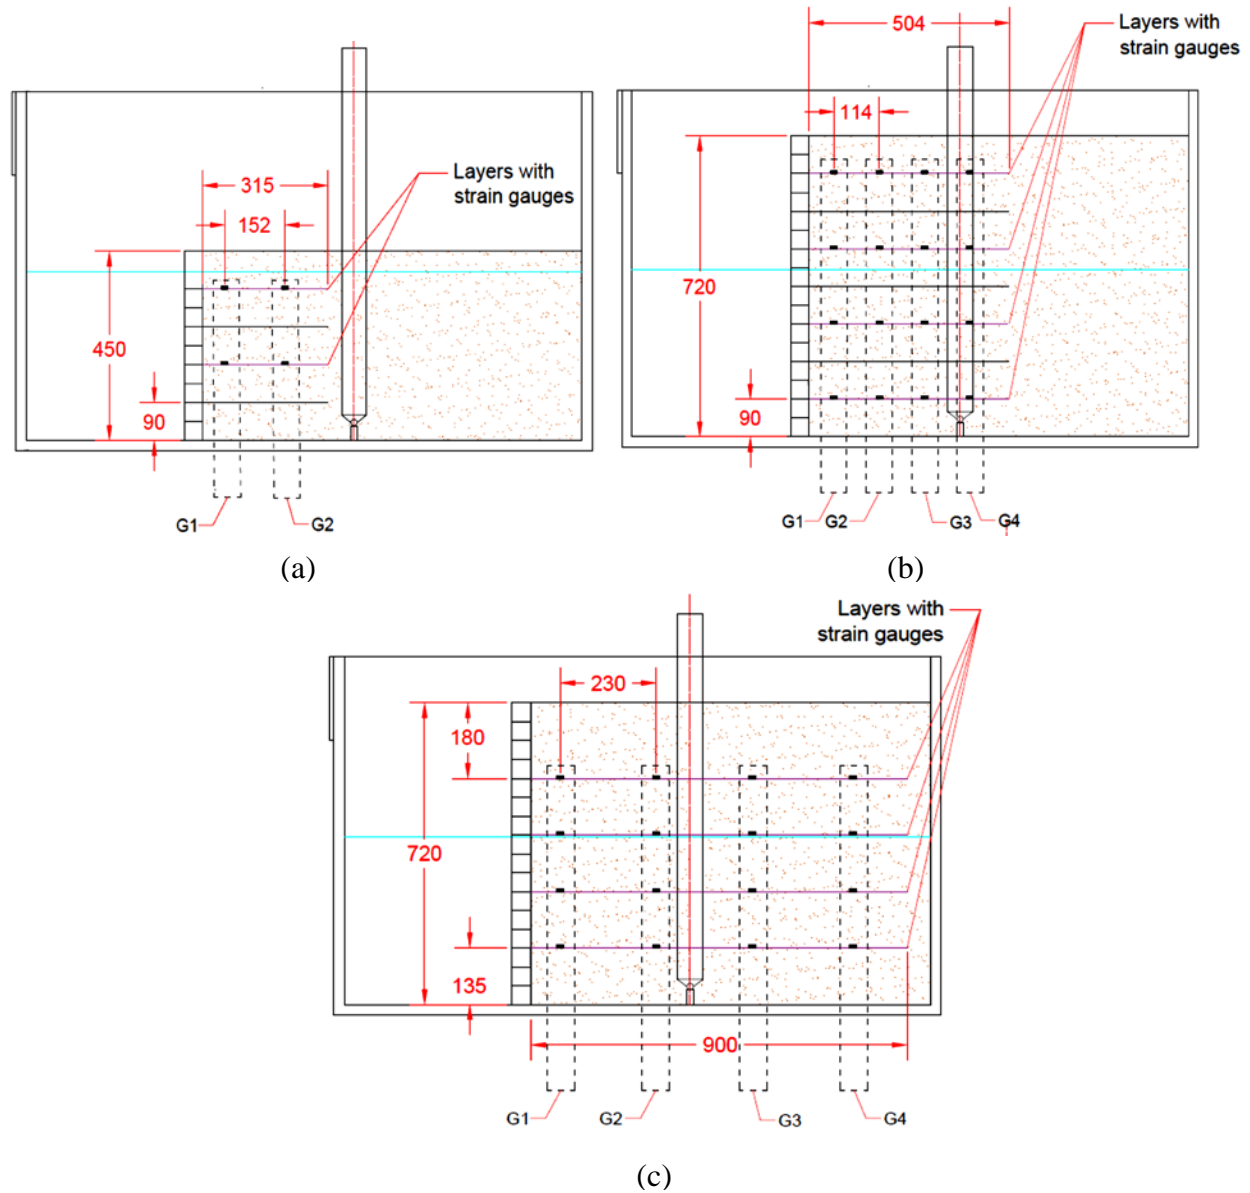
Layouts of the geogrid layers with strain gauges in (a) the low wall, (b) the high wall with small spacing, and (c) the high wall with large spacing (all dimensions in mm).
